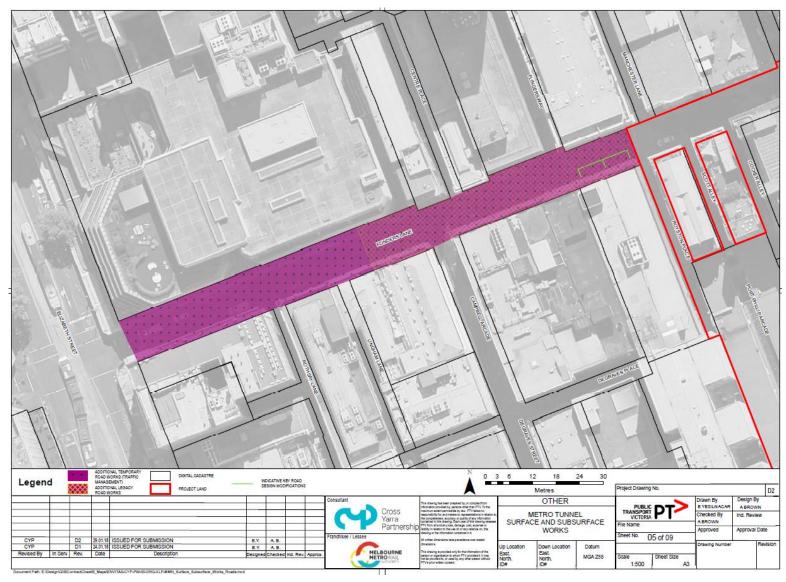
FLINERS LANE ADDITIONAL ROAD SURFACE WORKS
